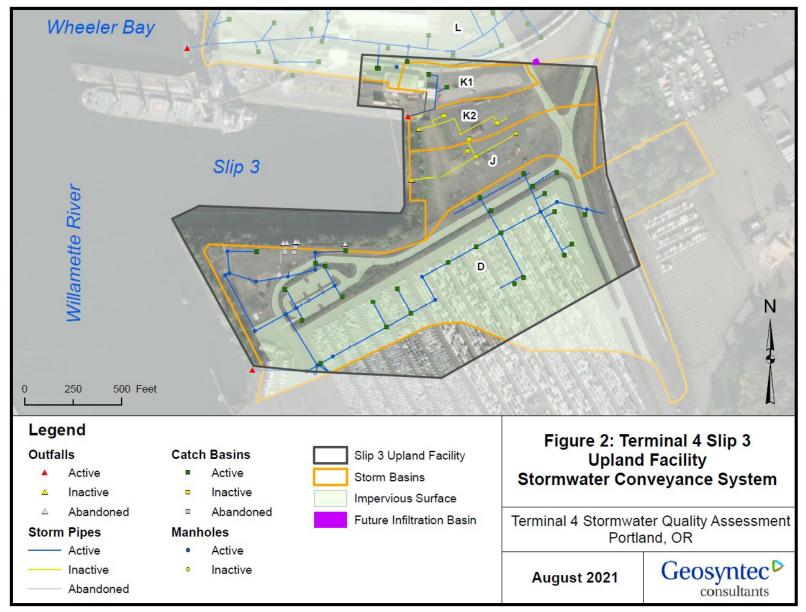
Terminal 4 Slip 3 Upland Facility Stormwater Conveyance System
